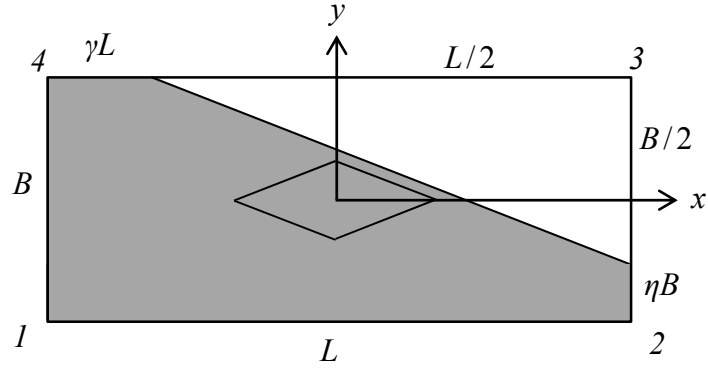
Footing with Corners 1, 2, and 4 Detached.
